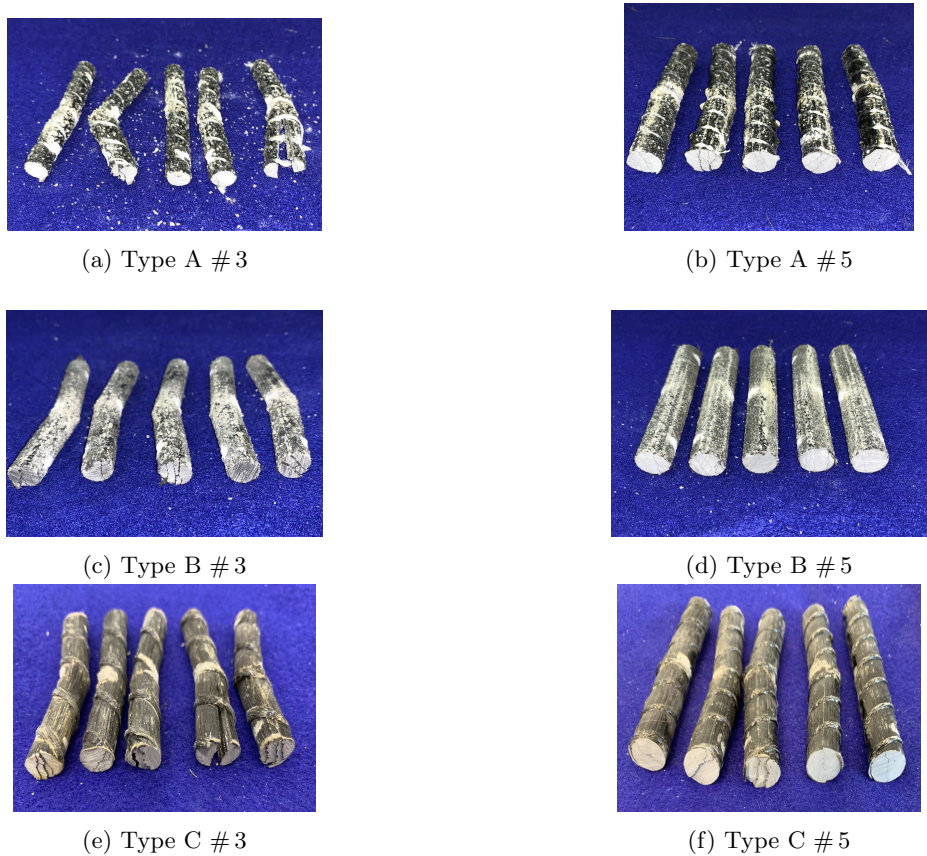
Failure pattern for tested rebar after horizontal shear test
